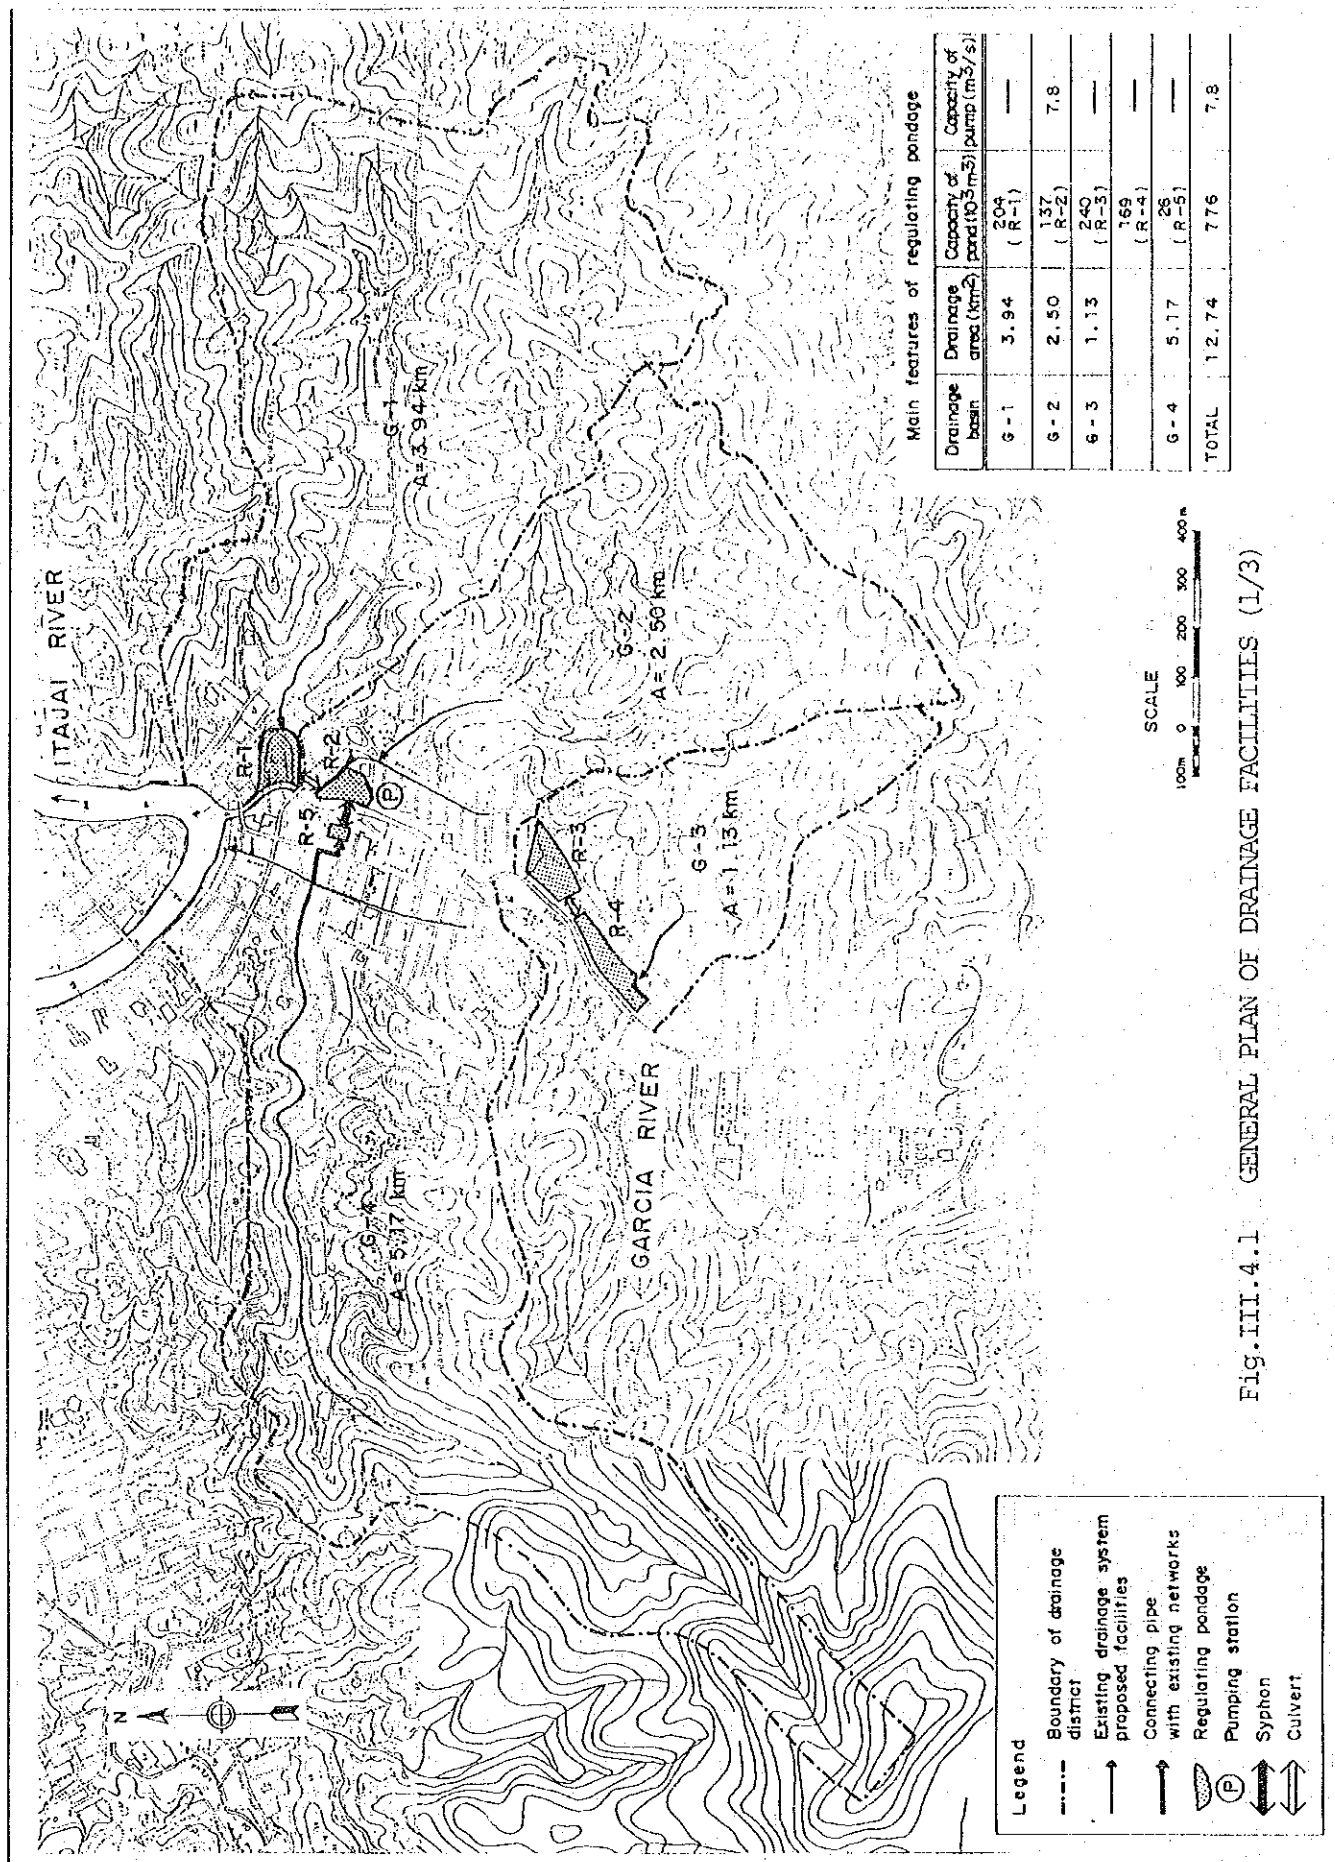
GENERAL PLAN OF DRAINAGE FACILITIES (1/3)
